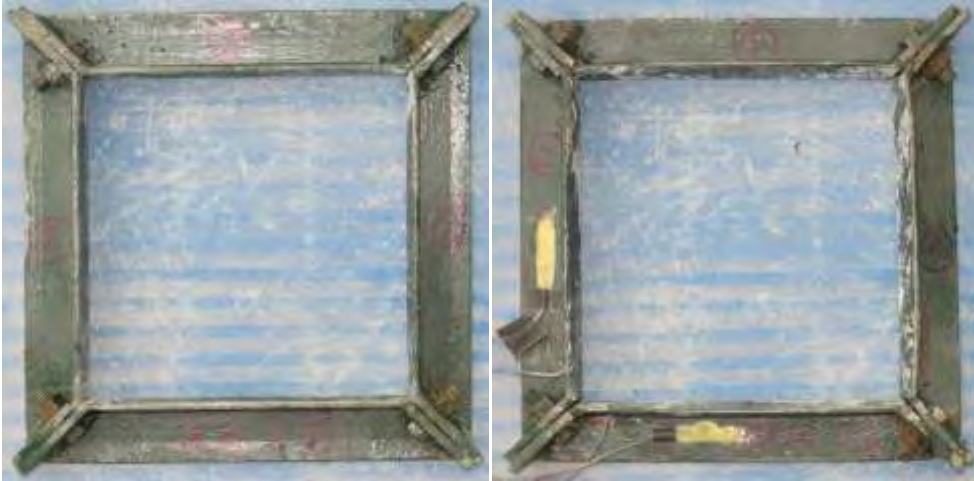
Specimen S04: (a) side 1; and (b) side 2 after the completion of the test
